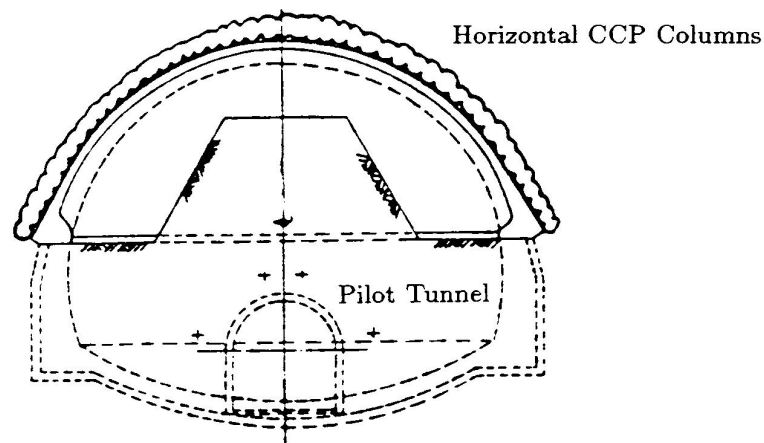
Horizontal Jet Grouting Pre Supported Section, with Pilot Tunnel Excavated Bellow Heading (São Paulo Roadway Tunnels)
